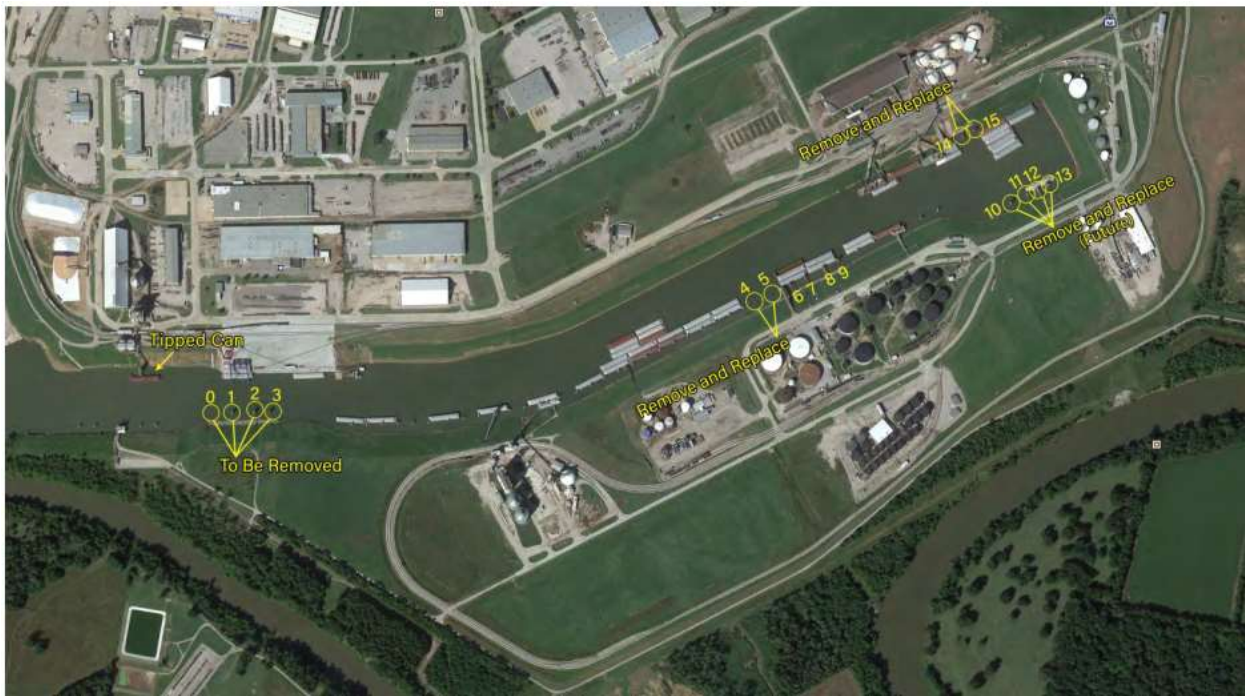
PORT OF CATOOSA SITE PLAN
